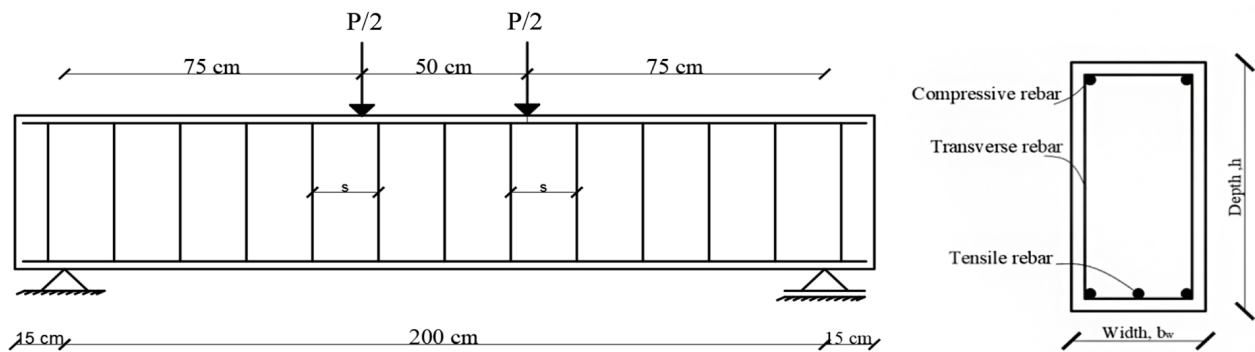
RC beam with GFRP rebars, (a) Longitudinal cross section, (b) Cross section
